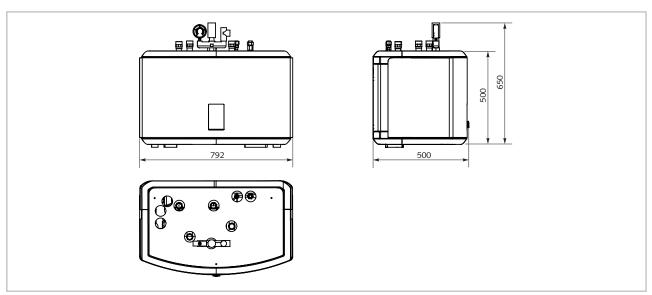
Dimensions indoor unit series WKF 80-170 (all dimensions in mm)
